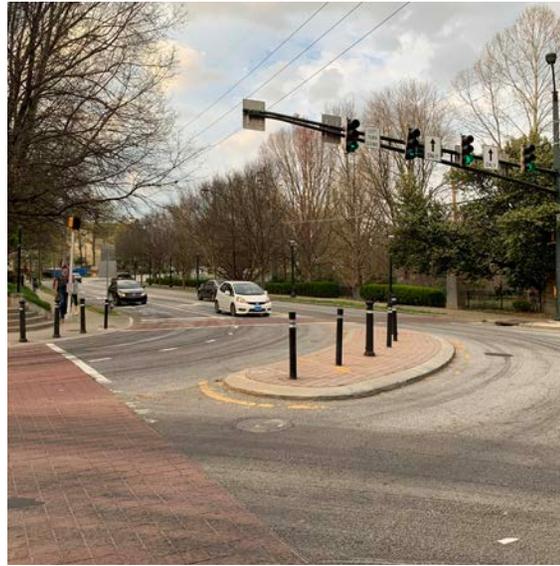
Piedmont Avenue Typical Section at 15th Street Facing North
